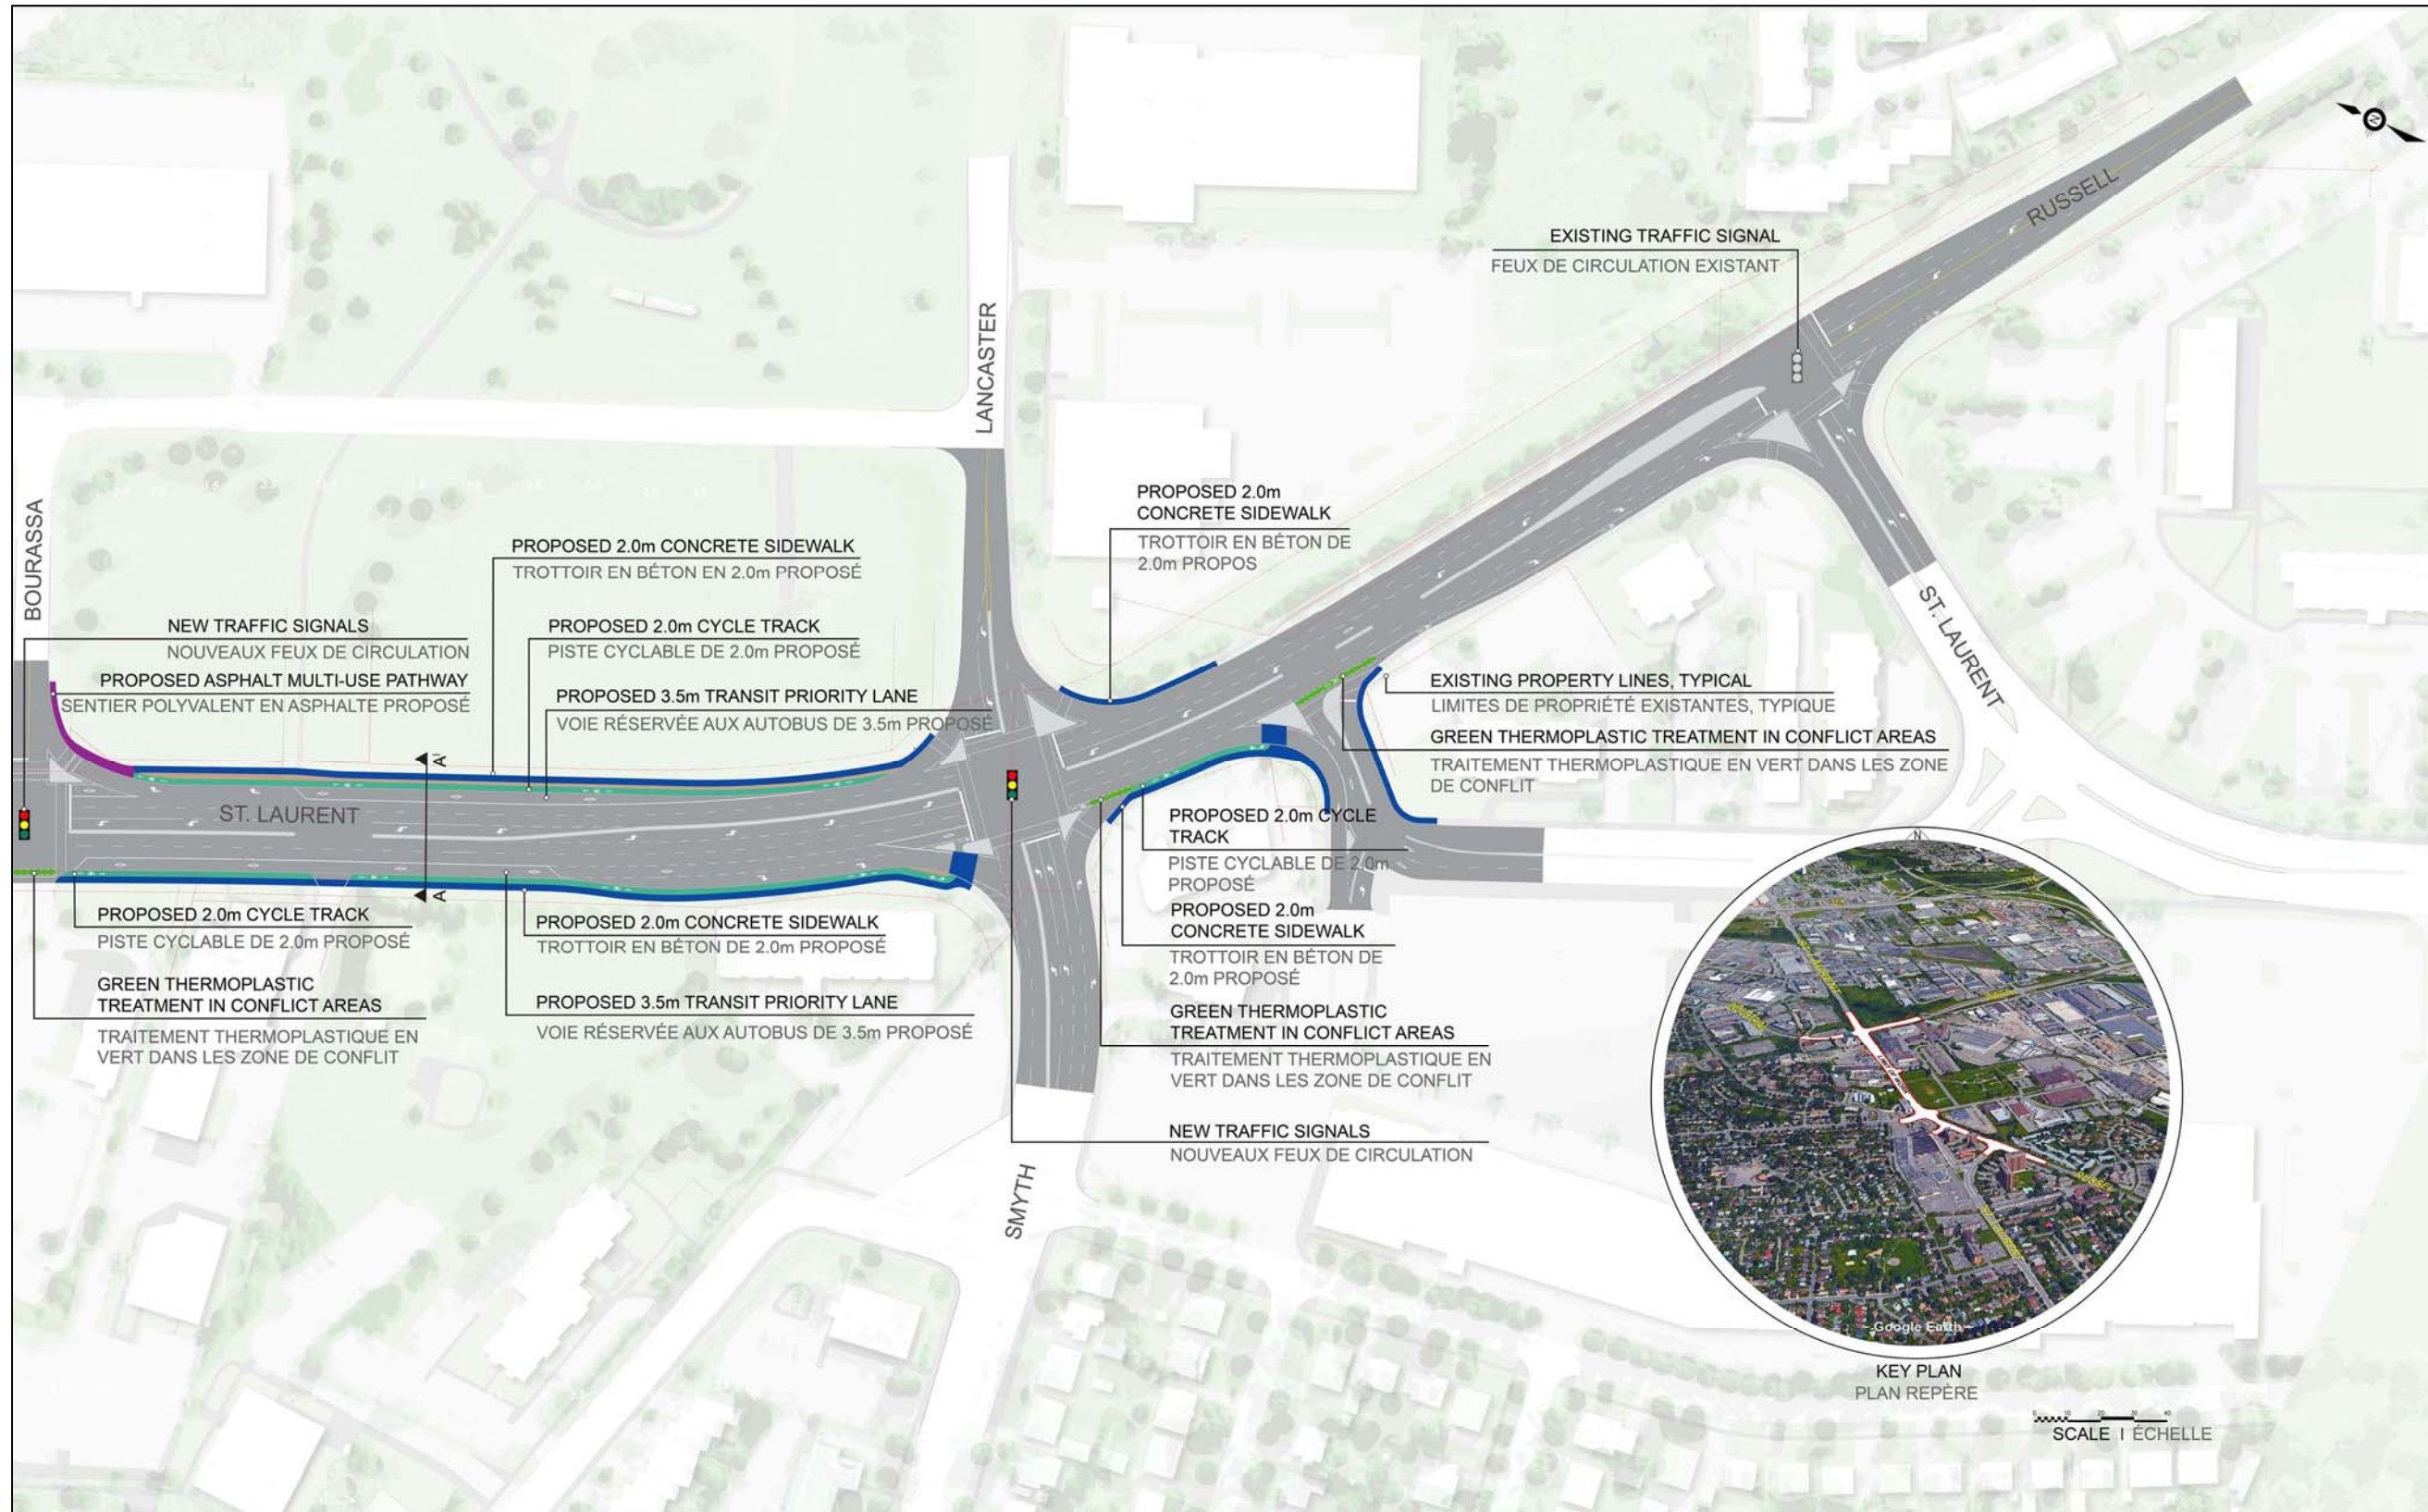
Overview of Recommended Plan, Bourassa Street to South of Smyth Road
